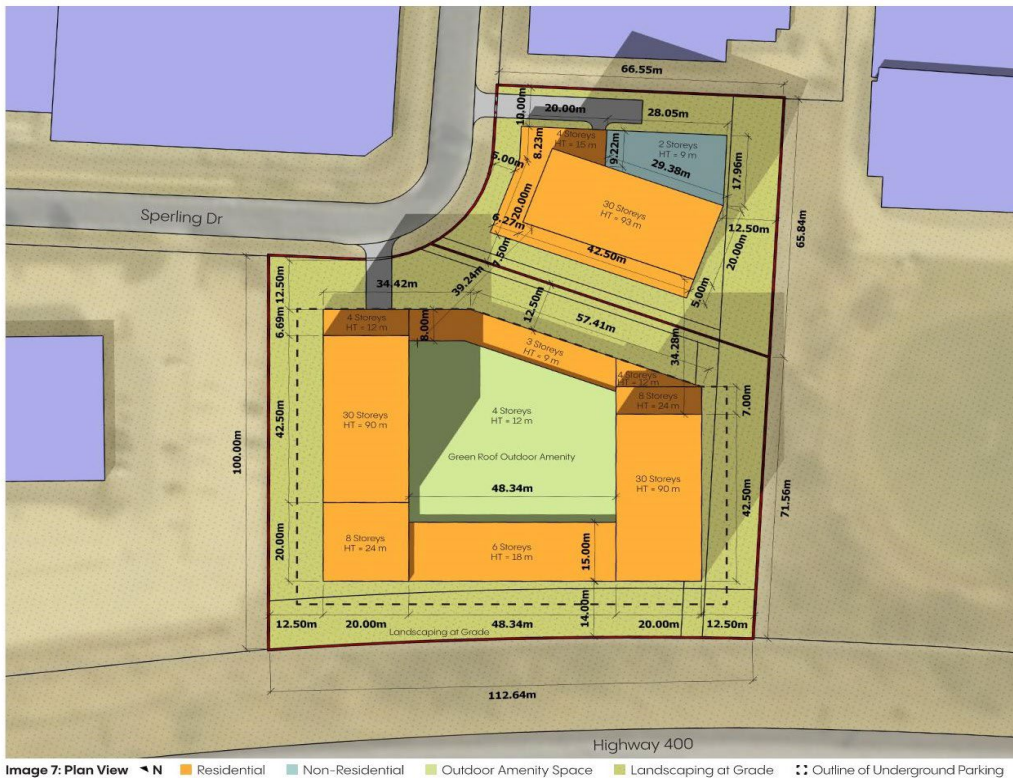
Plan View ◀ N Residential Non-Residential Outdoor Amenity Space Landscaping at Grade :: Outline of Underground Parking
